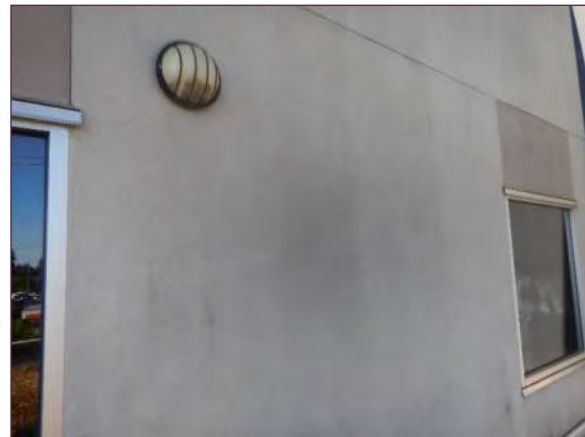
Stucco cracking, N elevation
